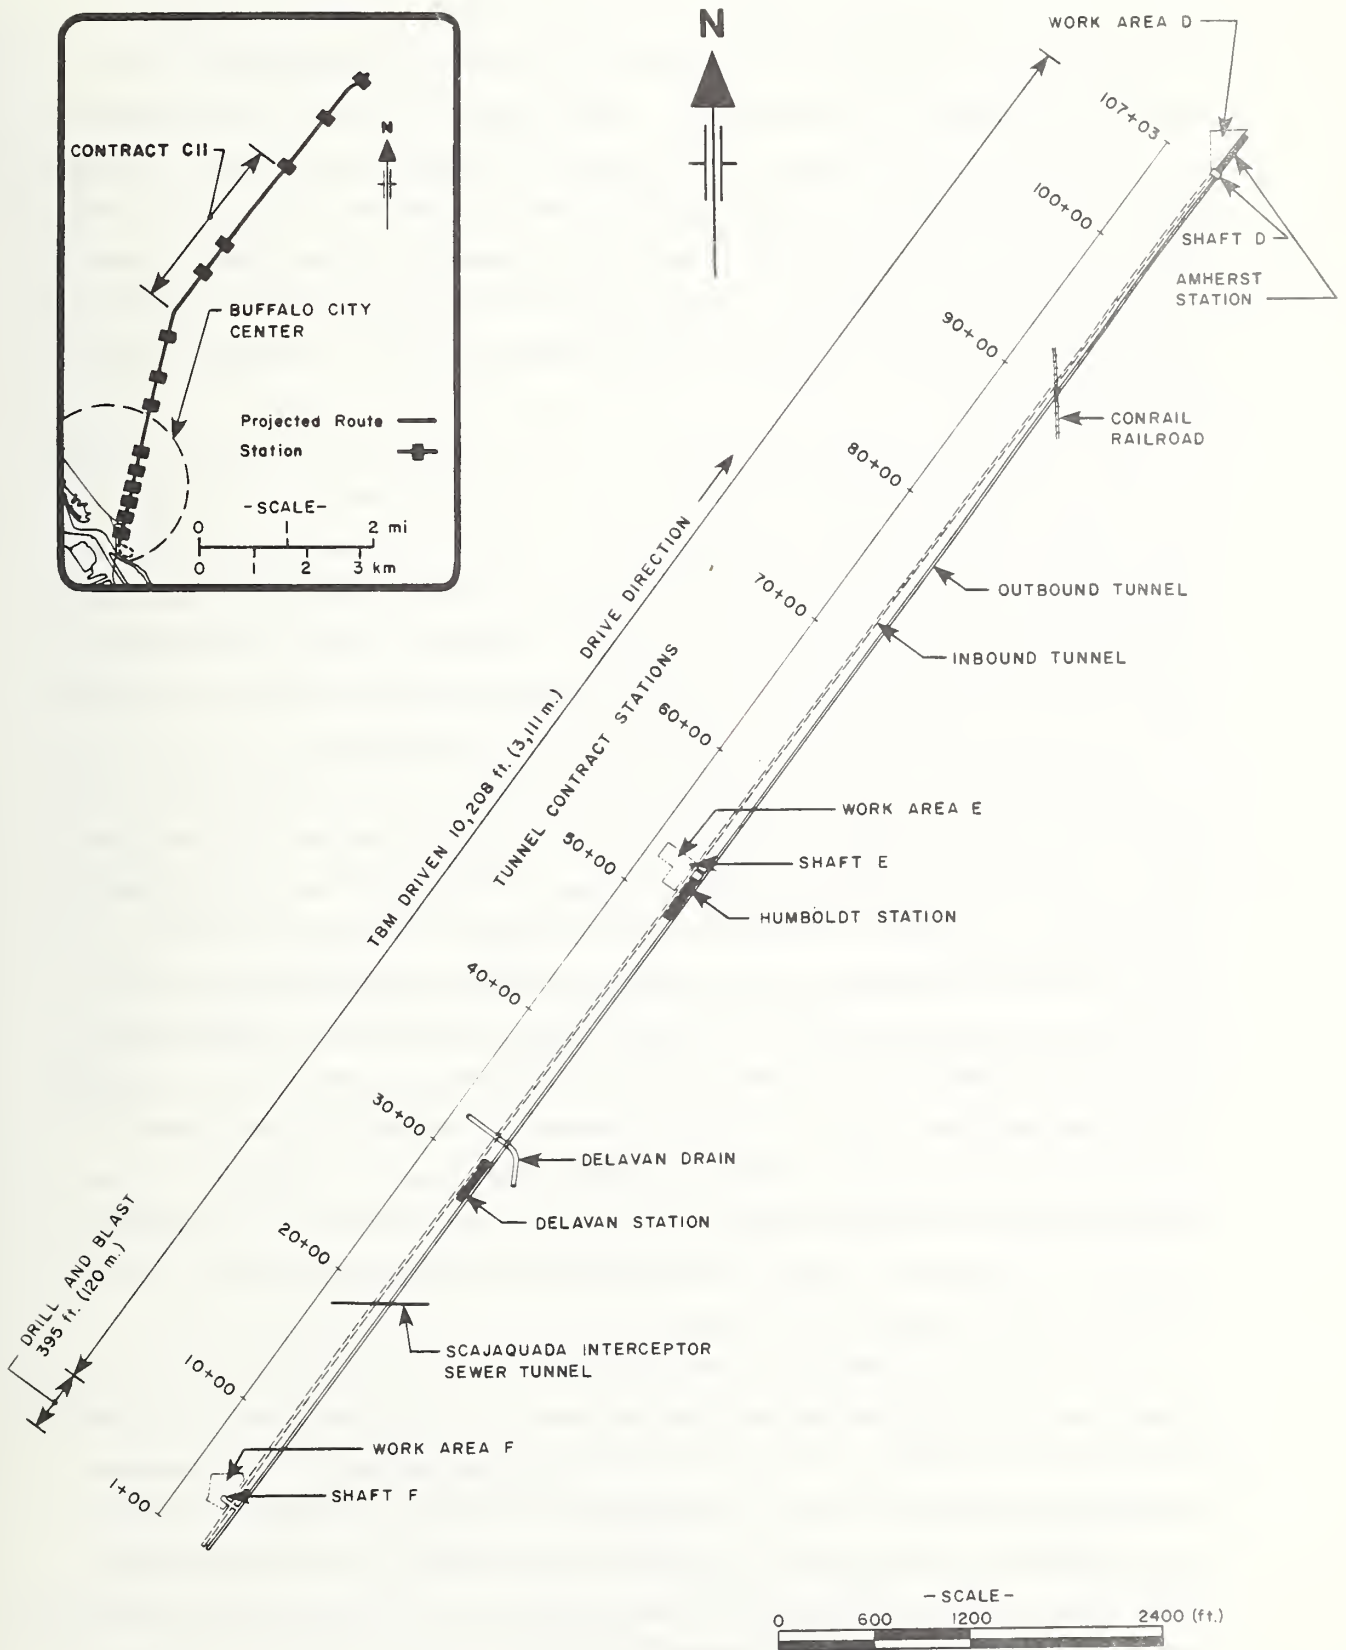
PLAN VIEW OF CONTRACT C11, BUFFALO LRRT
